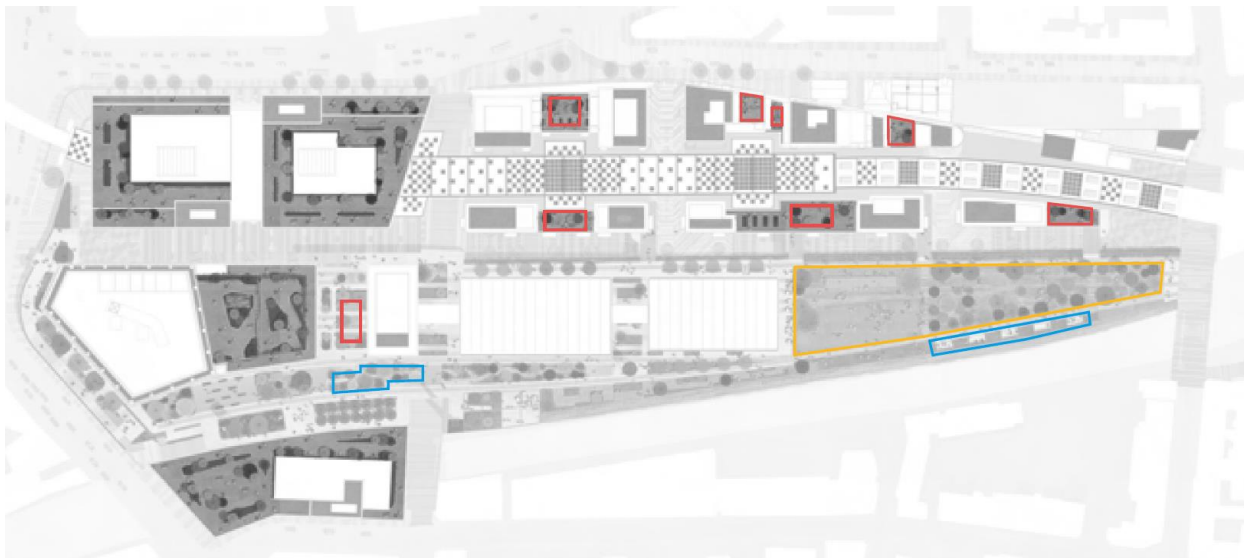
indicative proposed play space locations; red outline, 0-5; orange outline, all ages; blue outline, 12+
